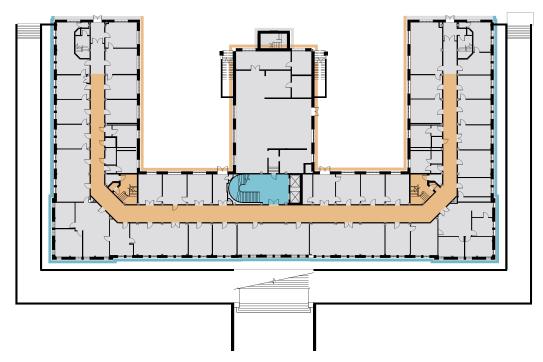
FRB-East Building Concourse preservation zone diagram.
